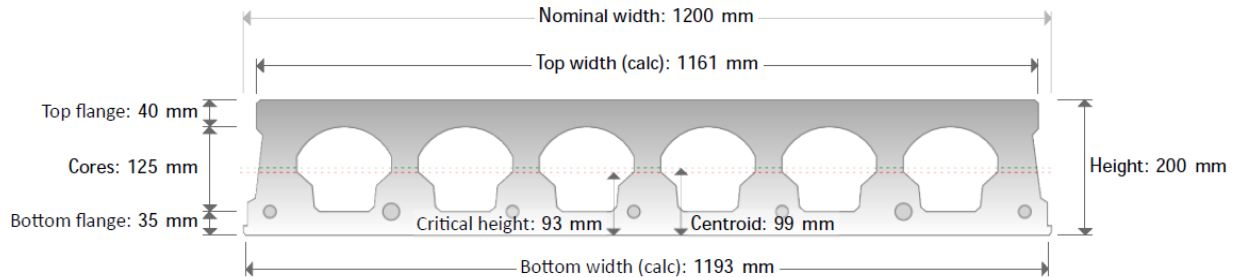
Cross-section of the precast prestressed hollow core slabs
